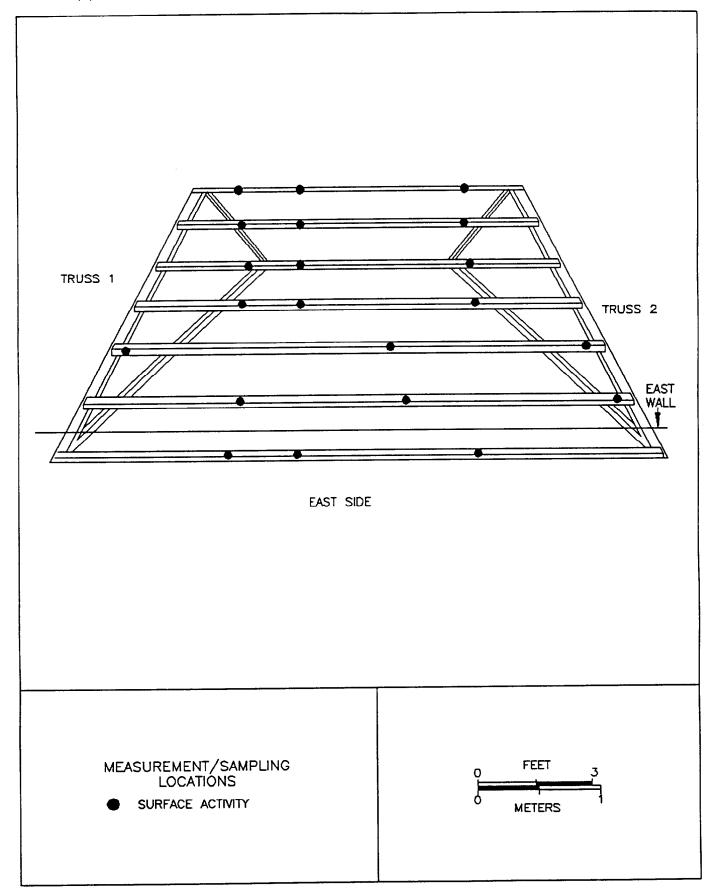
Building 8, Bay 1, East — Measurement and Sampling Locations
